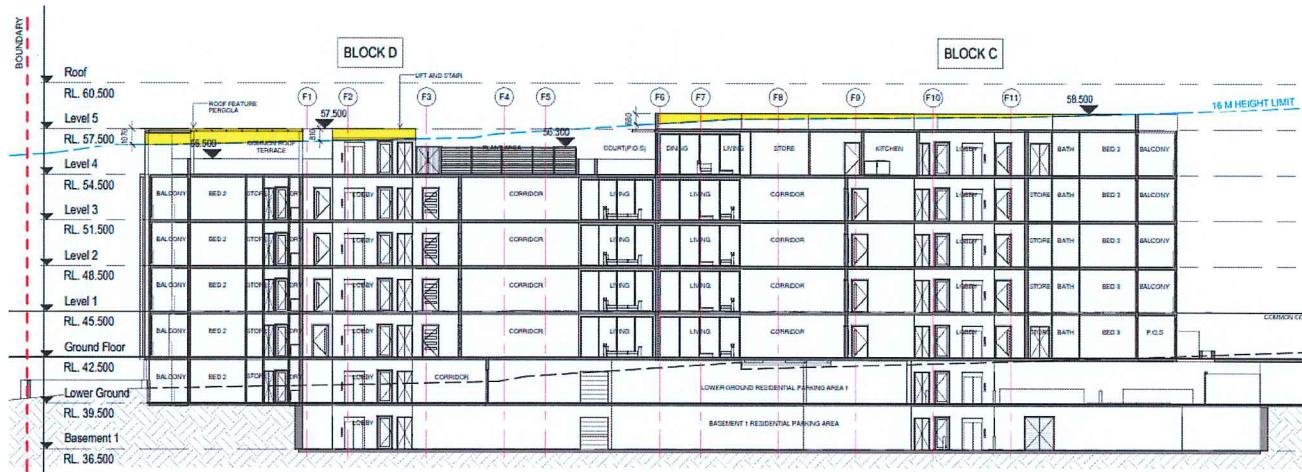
Section Building 02 – Blocks C and D - Maximum Building Height Analysis
